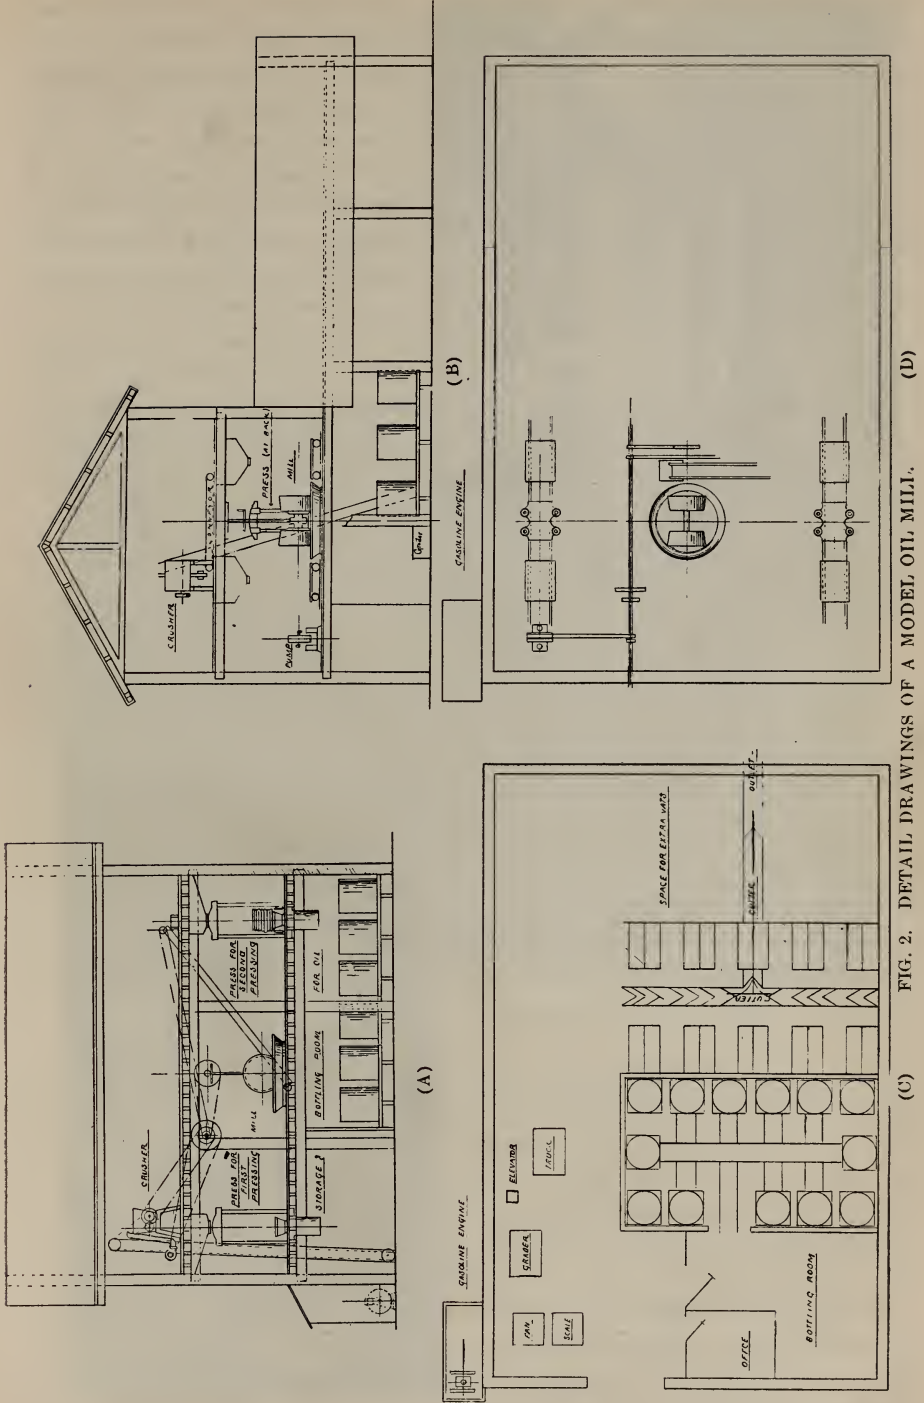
DETAIL DRAWINGS OF A MODEL OIL MILL.
